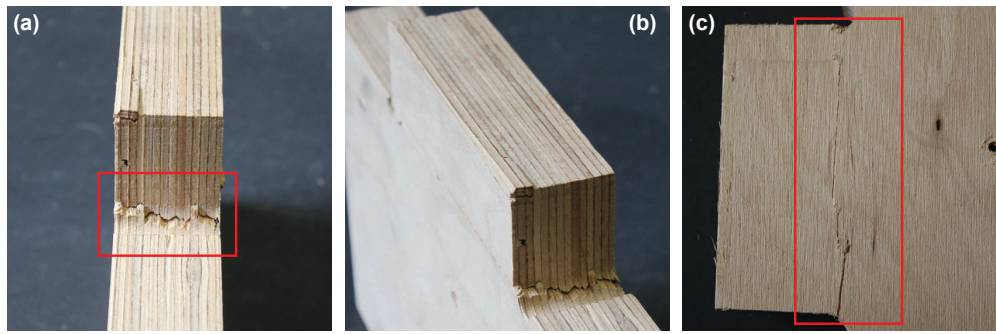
Failure photographs of T4 specimens: (a) Side view (b) Axonometry (c) Front view.
